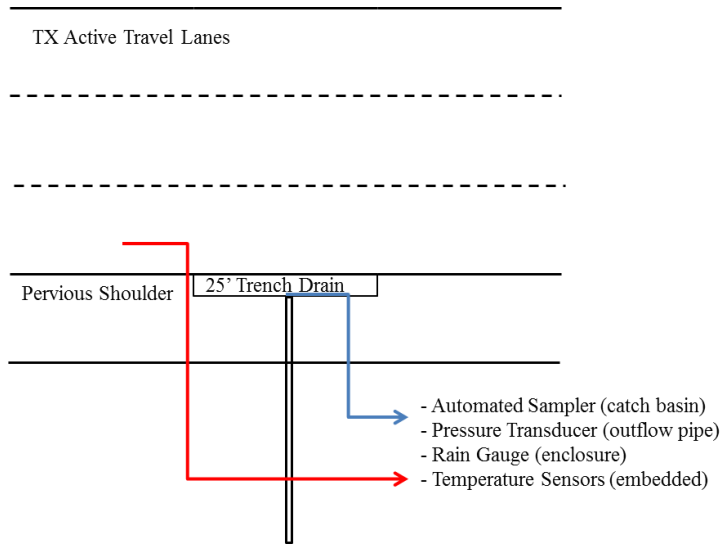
Pervious concrete shoulder collection and monitoring (not to scale)
